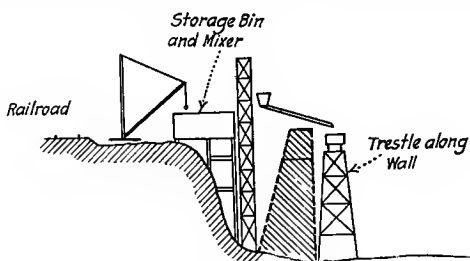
Central mixing plant. Combined tower and trestle distribution.
